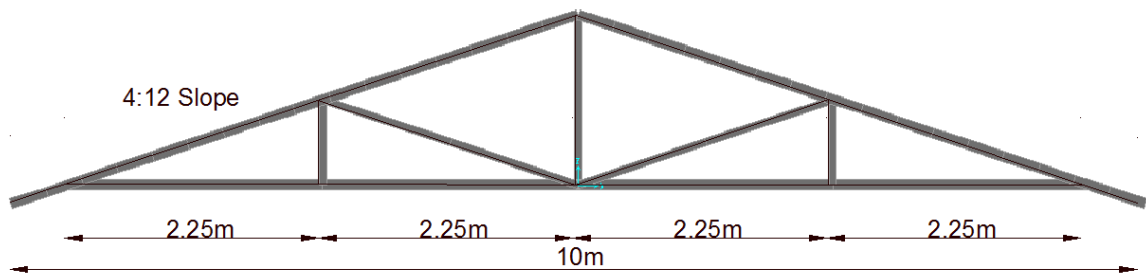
Elevation view and dimensions of interior Howe-style truss
